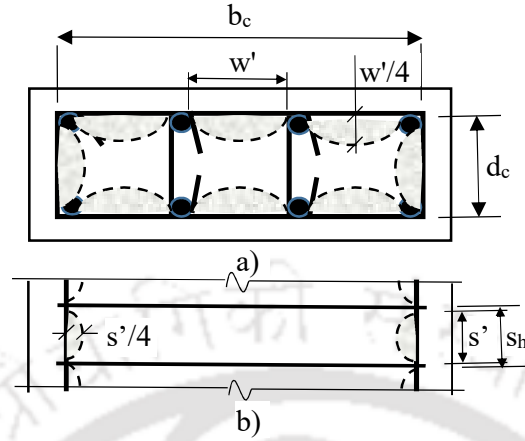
Effect of confinement in rectangular section: a) Cross section, b) Elevation. Shaded area shows the unconfined zones.
